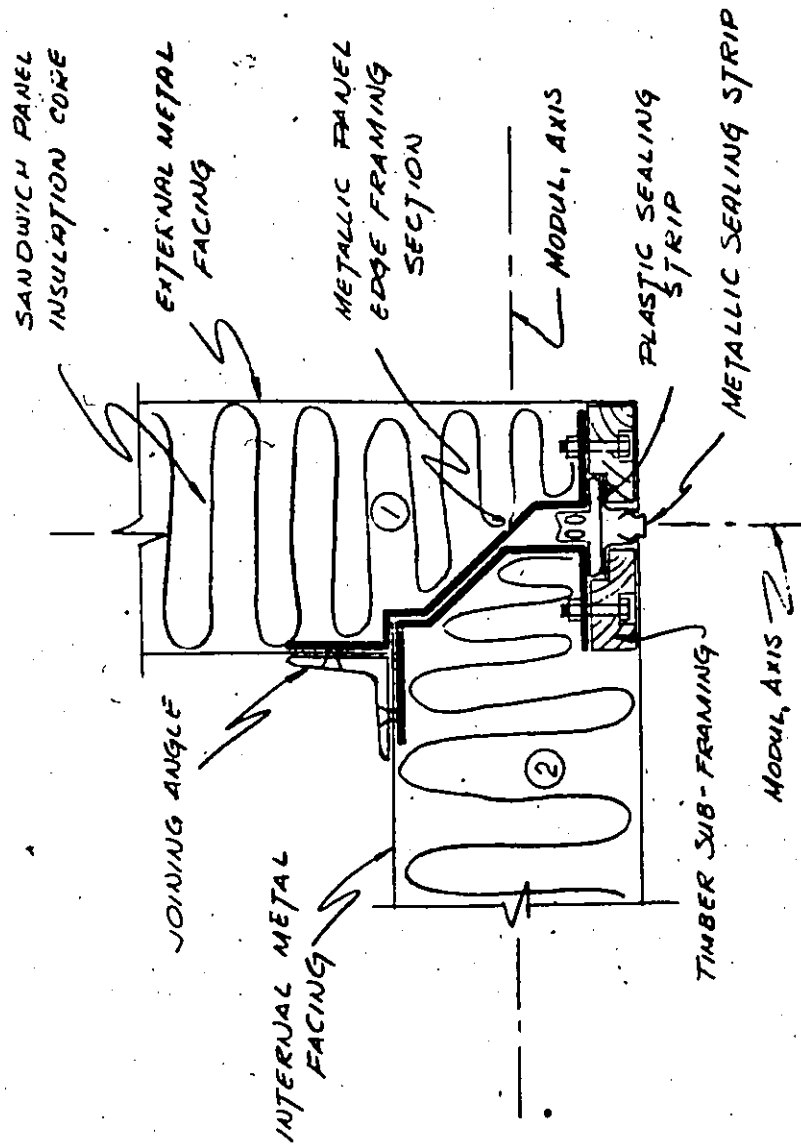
VERTICAL JOINT OF EXTERNAL WALL PANELS AT THE BUILDING CORNER
